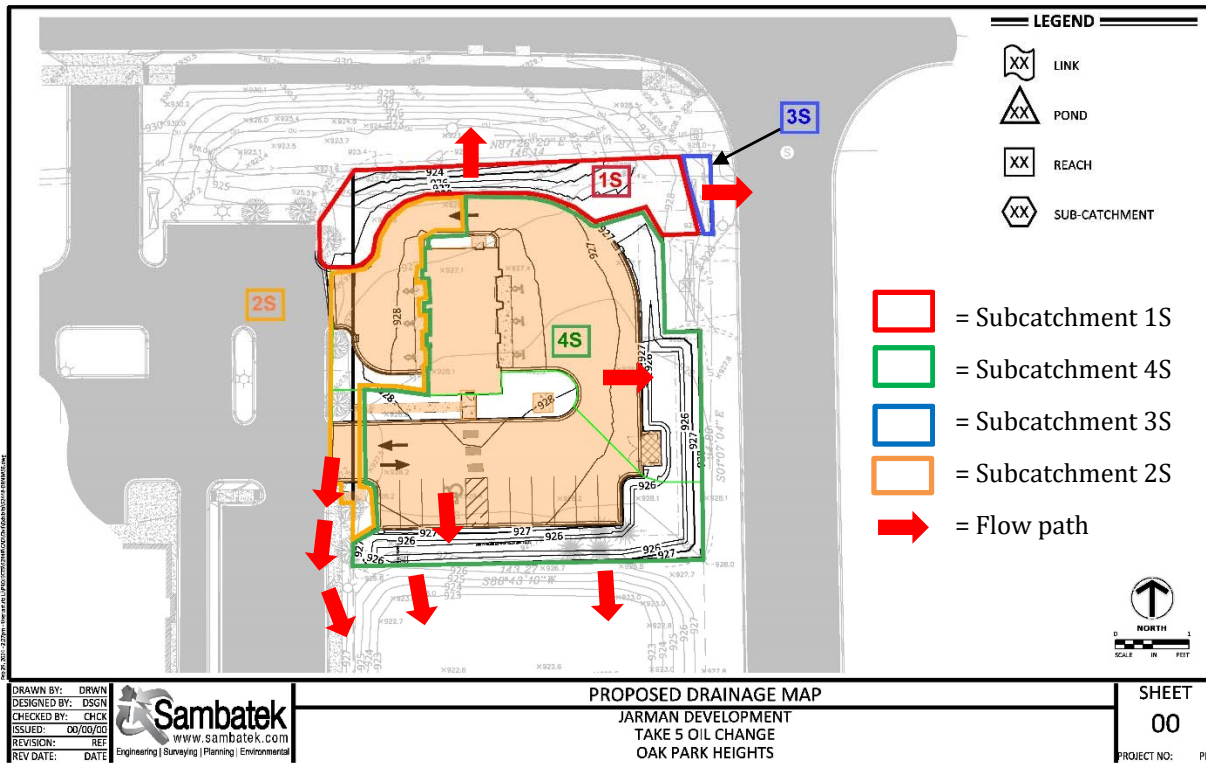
Proposed site drainage for Outlot A (Take 5 Oil Change).
